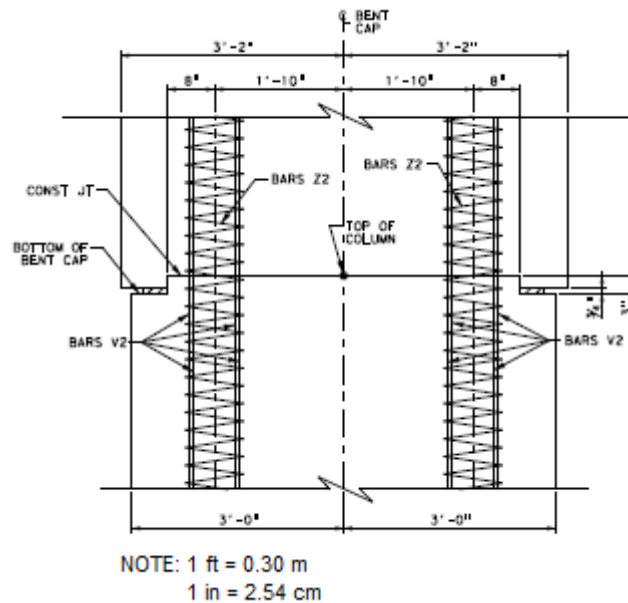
Post-Tensioned Cap. Transverse Section at Support
